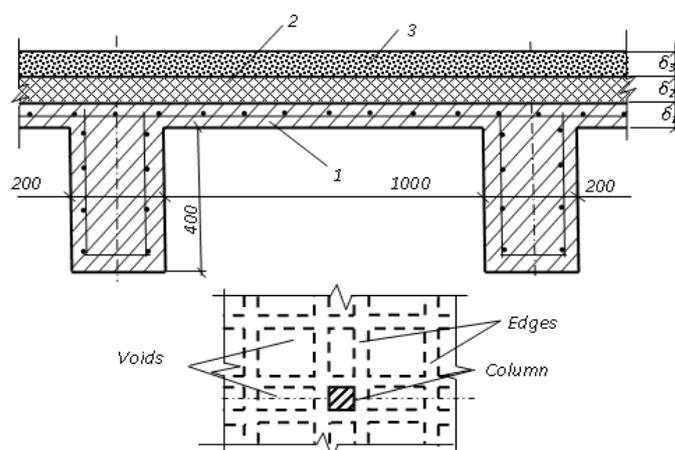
Pan floor: 1 – heavy layer concrete; 2 – a layer of heat-insulation material; 3 – top protective layer.
